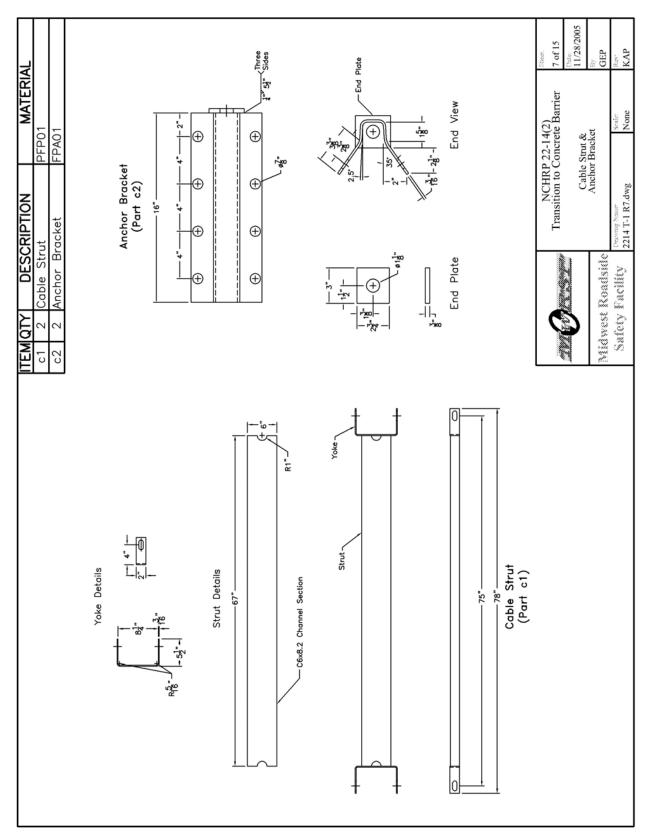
Approach Guardrail Transition to Concrete Barrier Design - Anchorage Details (English)
